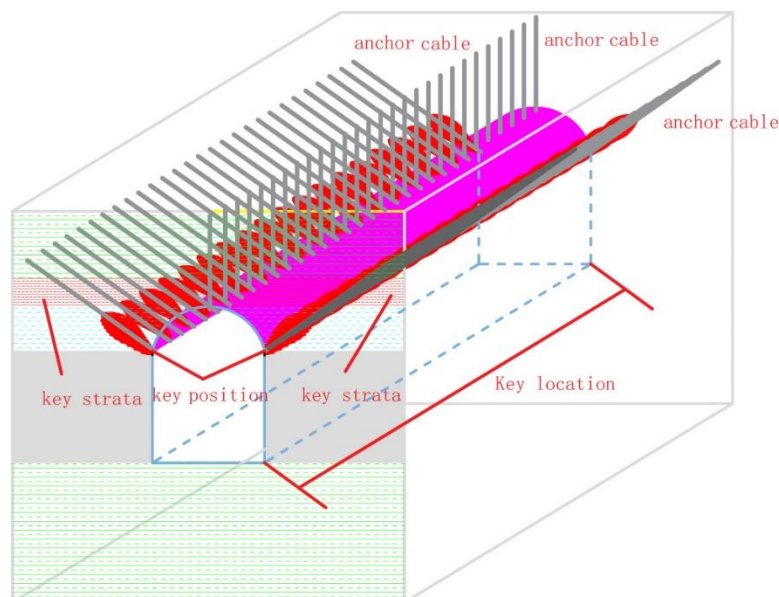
Schematic diagram of "spatial trinity" key control technology system of roadway surrounding rock
